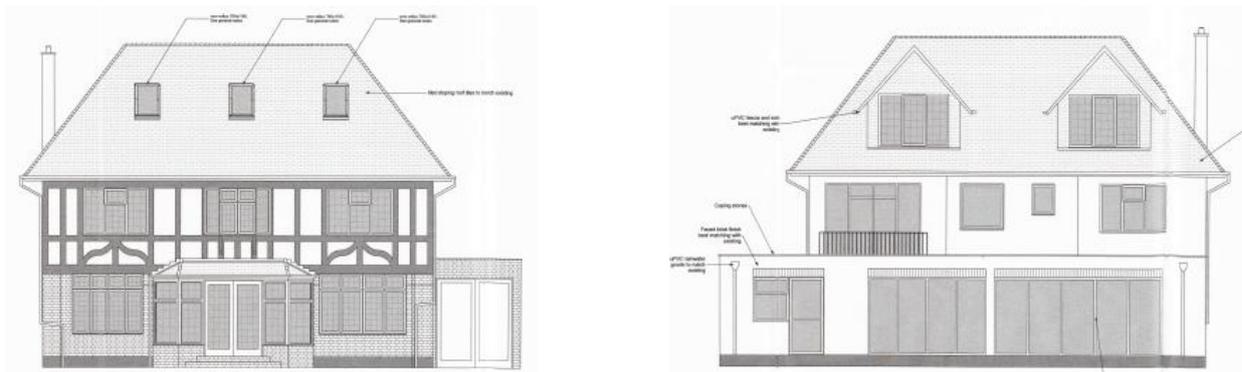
18/03246/FULL6 – Approved Front and Rear Elevations
